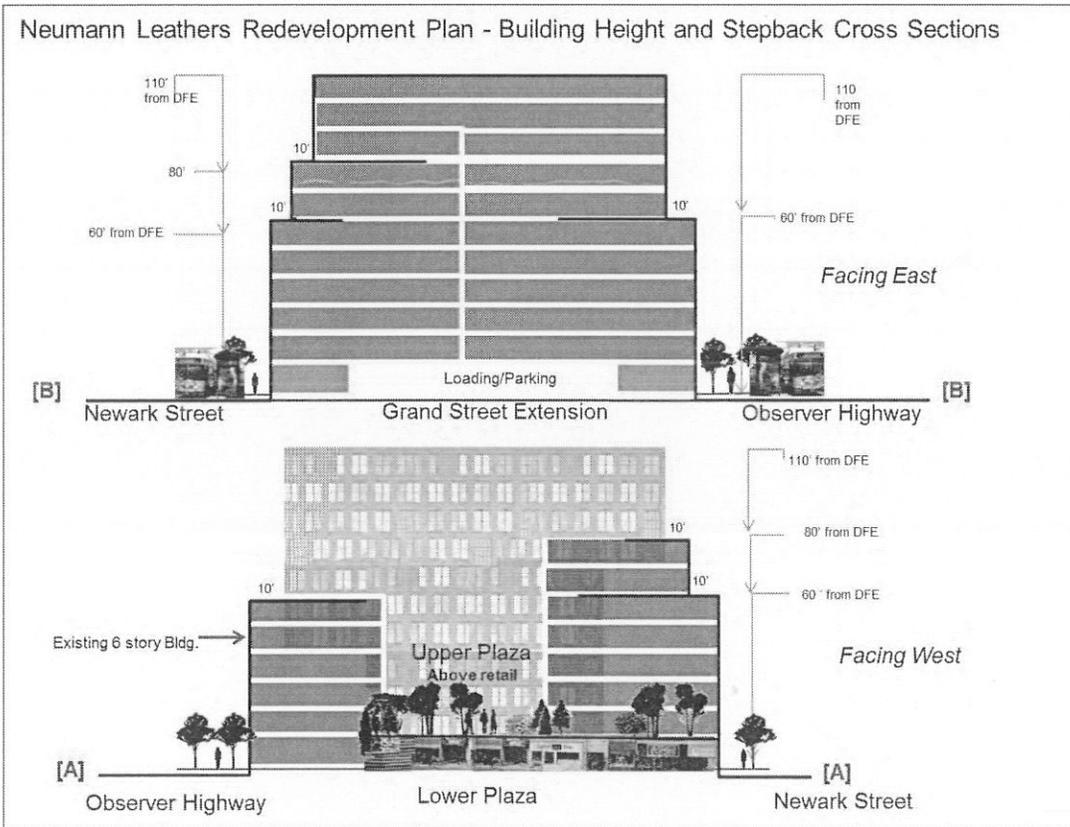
Cross Sections A-A and B-B from Infill Framework Plan (Fig. 11) showing building heights and setbacks from Observer Highway and Newark Street.
